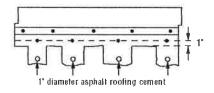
Fastening Presidential and Presidential T/L Sbake sbingles on steep slopes.
